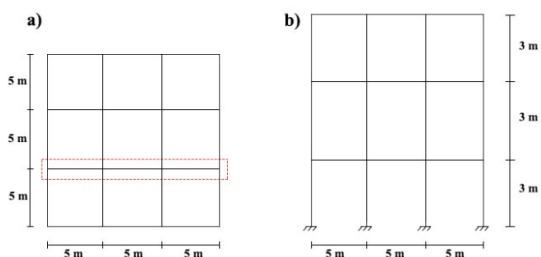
The schematic view of the RC-MRFs; a) plan; b) elevation
